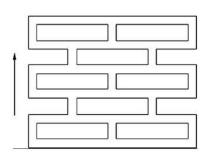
Lightweight concrete masonry units — Geometry 1,7/0,8
